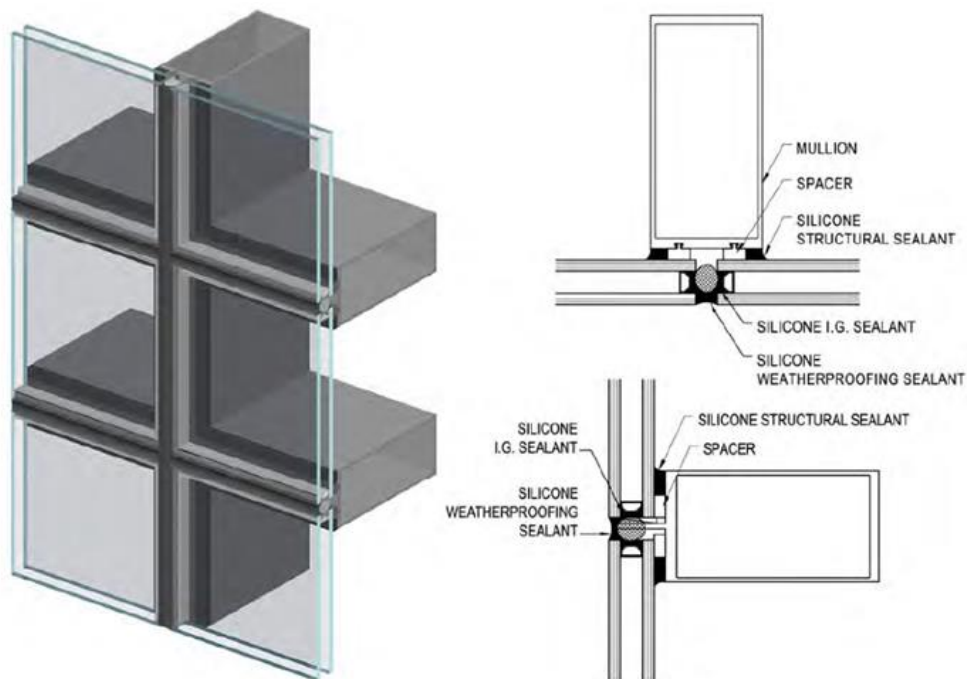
Four-sided structural glazing application. To the right the horizontal (top) and the vertical (bottom) details /section are presented (Source: DOW, 2021).
